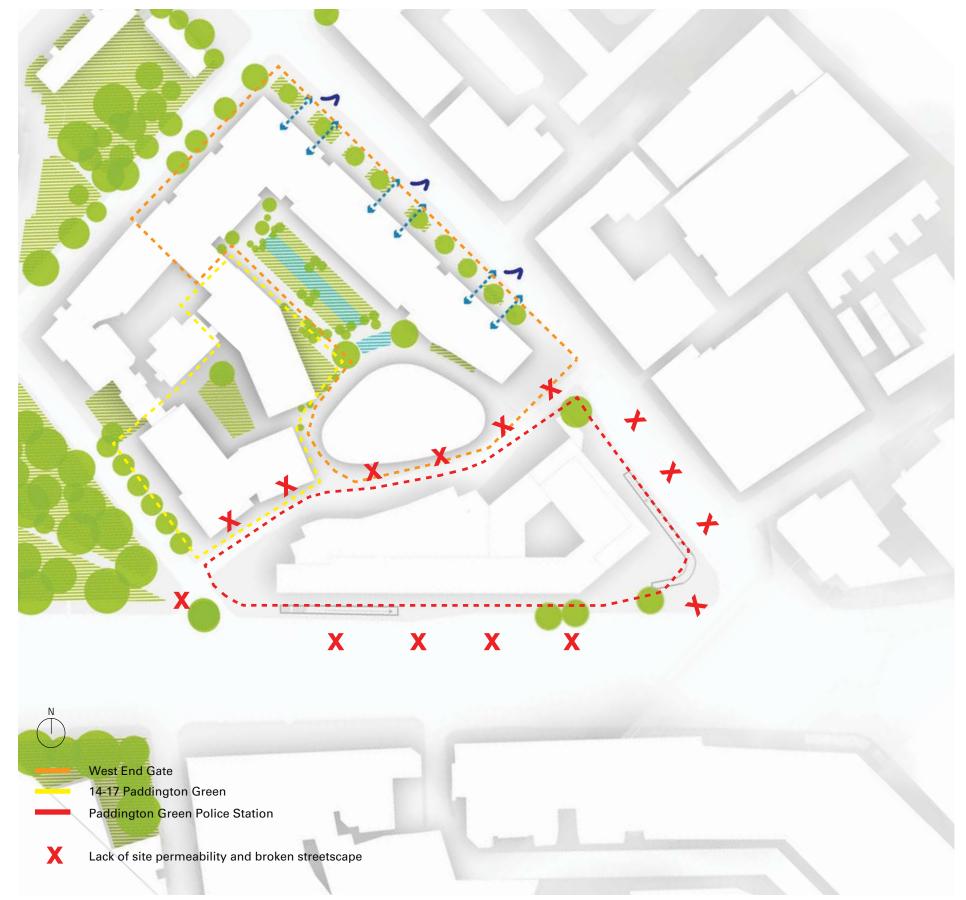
Paddington Green Police Station - Existing site constraints
